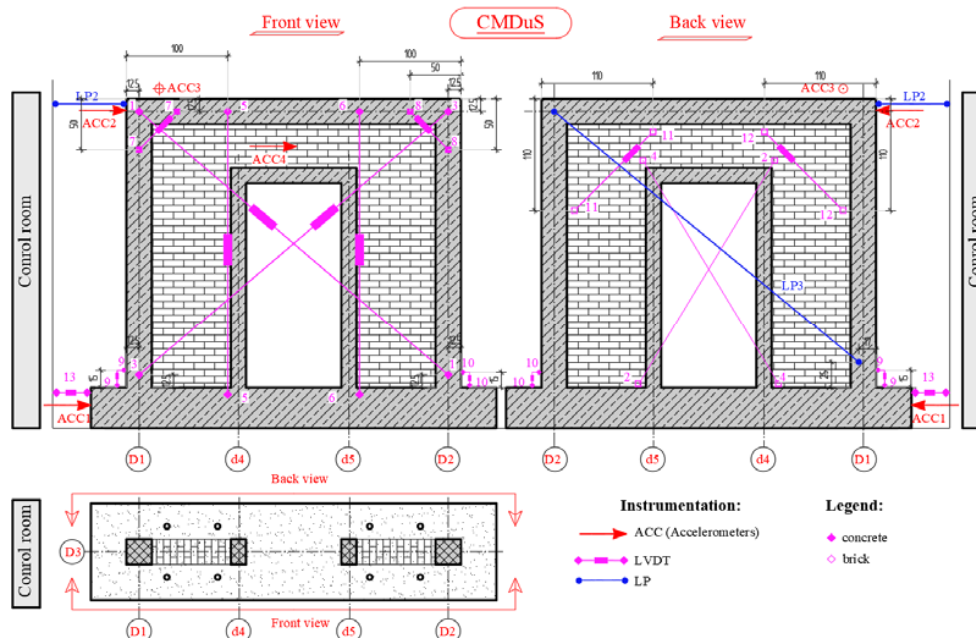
Instrumentation scheme of specimens CMDuS – technical drawing (front and back view)
